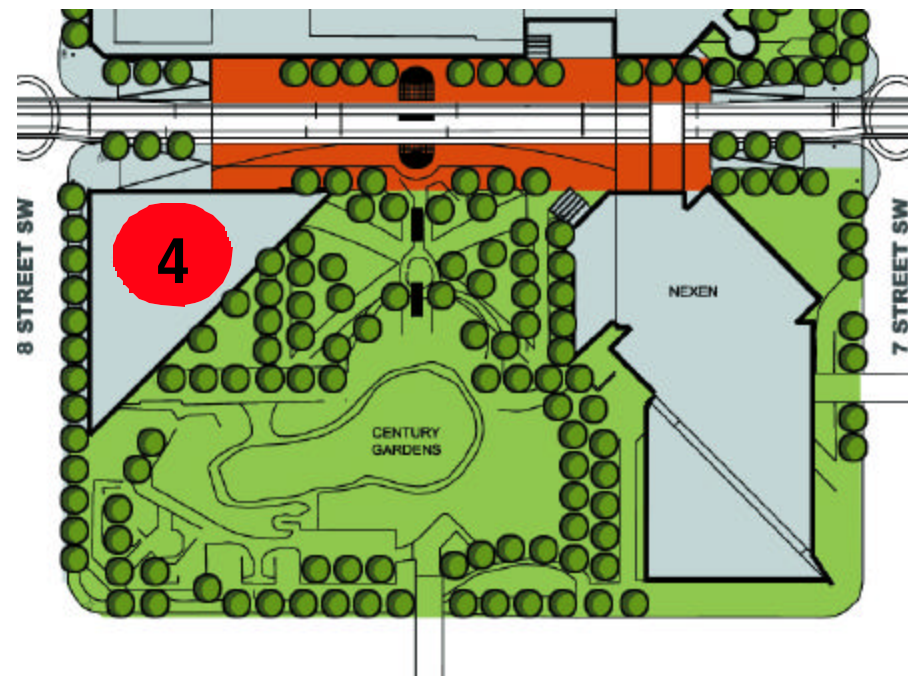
, Site 4 on the Southeast corner of 8th Street and 7th Avenue (Block D)
